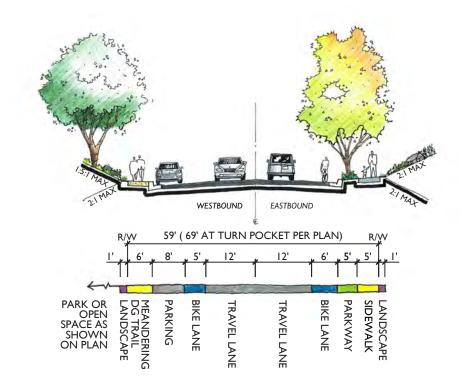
Residential Collector Type I (Fanita Parkway to Cuyamaca Street) illustrates the residential collector street located adjacent to the south drainage connecting Fanita Parkway and Cuyamaca Street. This roadway is adjacent to the southerly bank of the drainage and is elevated above Fanita Commons offering significant views of the main Village Center below. A neighborhood park and 6-foot trail along the drainage provide recreational opportunities, as well as a pedestrian connection via a pedestrian bridge to the school site and the Village Center.
